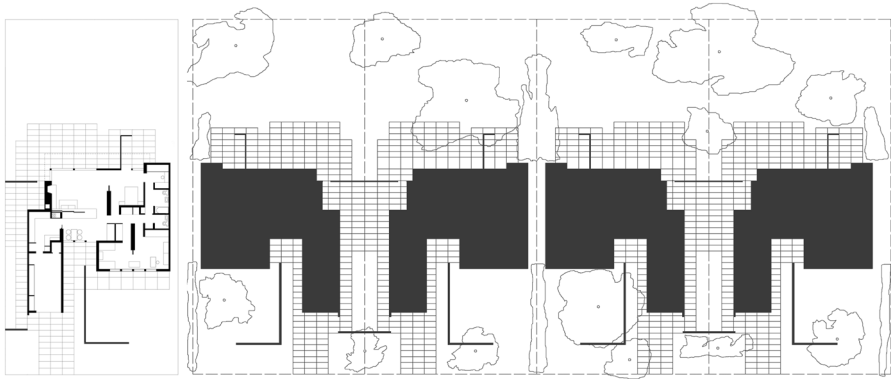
Typical unit plan and its arrangements along the street. Image: author
